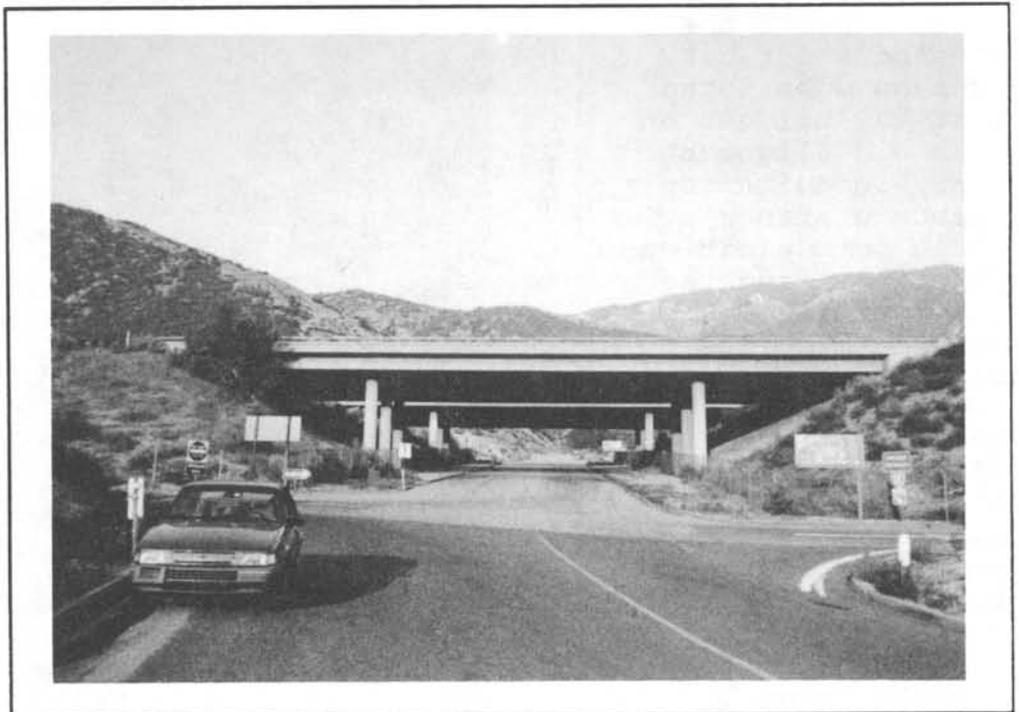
I-15 Bridge Over Kenwood Avenue
